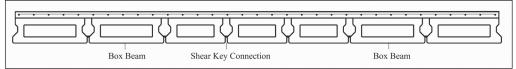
Transverse section of a standard box-beam bridge. Examples of a box beam and a shear-key connection are identified. Figure adapted from Texas Department of Transportation (TxDOT) blueprint of pre-stressed concrete box-beam spans.
